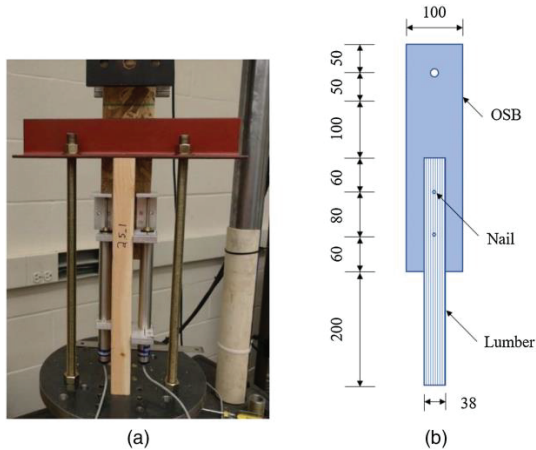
Nail joint test: (a) Test set up, (b) Specimen dimension (mm) [3]
